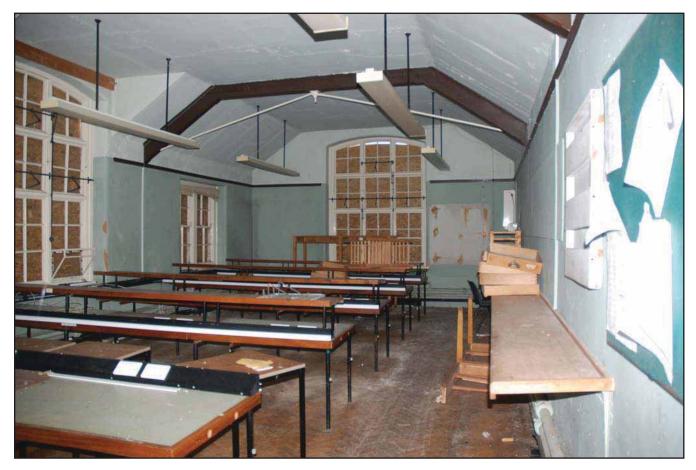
Detached north building First Floor Room F01 - general room shot looking west. Scale: 1.0m
